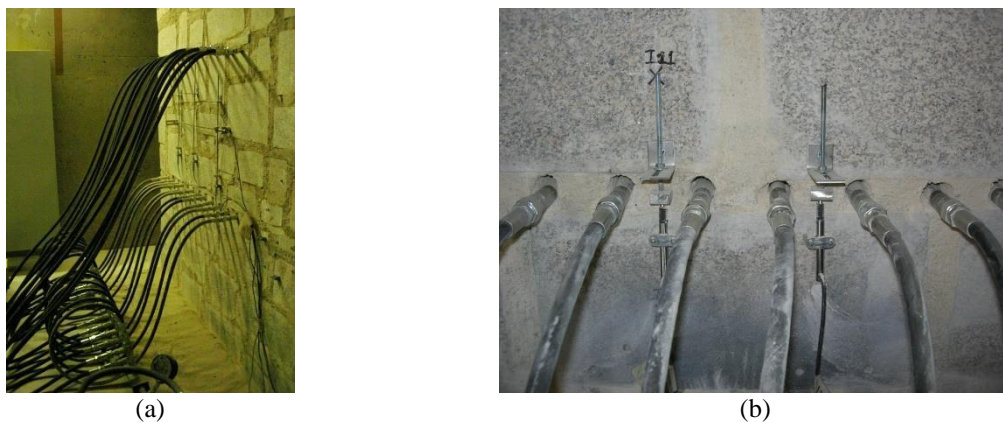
Water pressure system components: (a) connection hoses coming straight out from the wall and down to the connection strip; and (b) connection hoses not interfering with the LVDTs
